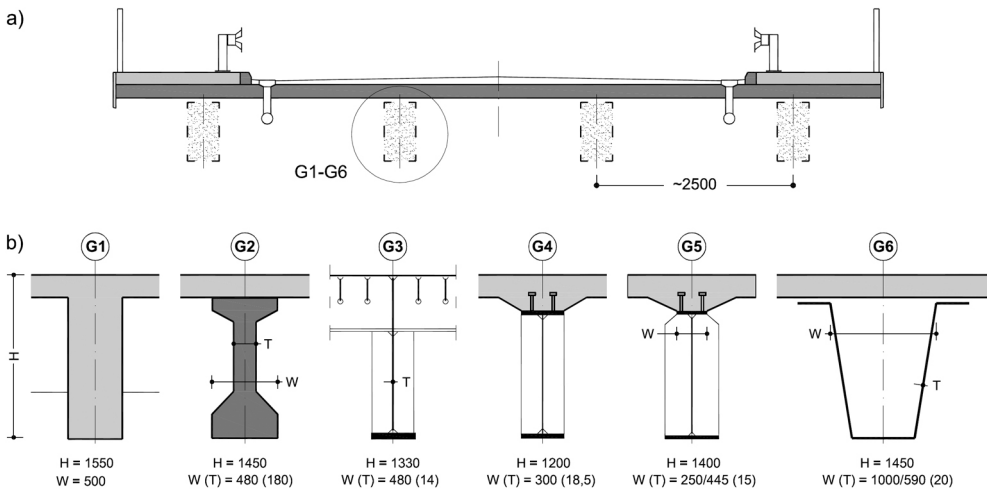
Cross-section of the analysed bridge span (a) and selected alternatives for G1 – G6 girders with dimensions (description in the text) (b)
